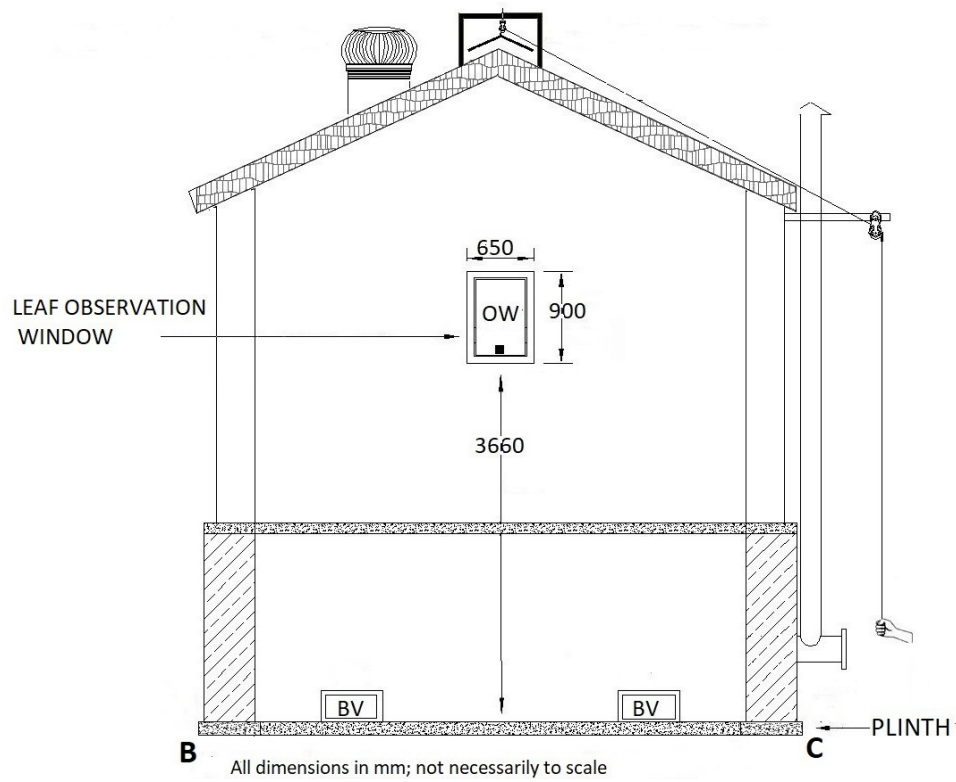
ELEVATION SIDE BC — BARN TYPE B
